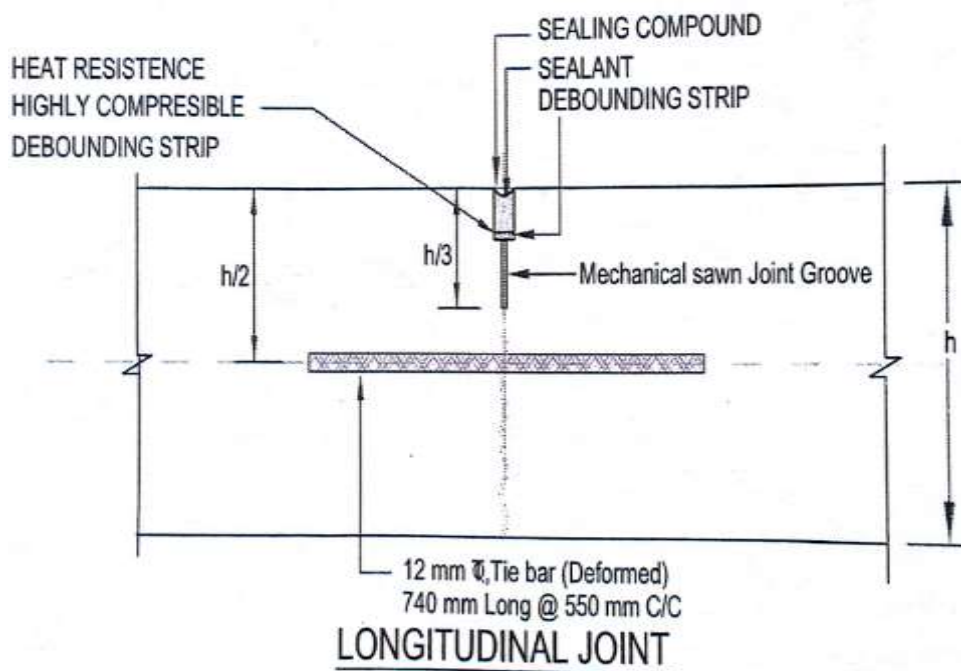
Longitudinal joint in Pavement Quality Concrete (PQC)
